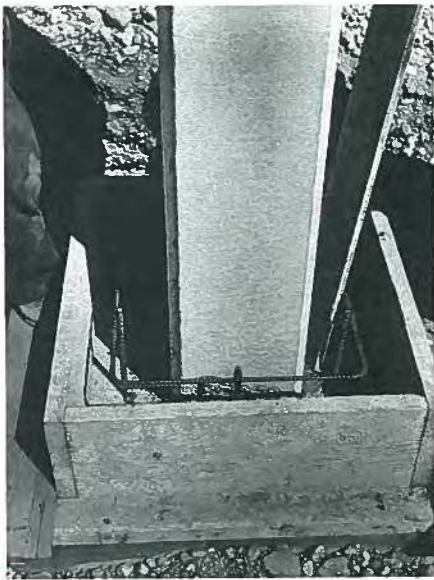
Precast concrete column is spotted neatly on footing inside reinforcing steel, then concrete is cast around the base (Tacoma City Light shop building).
